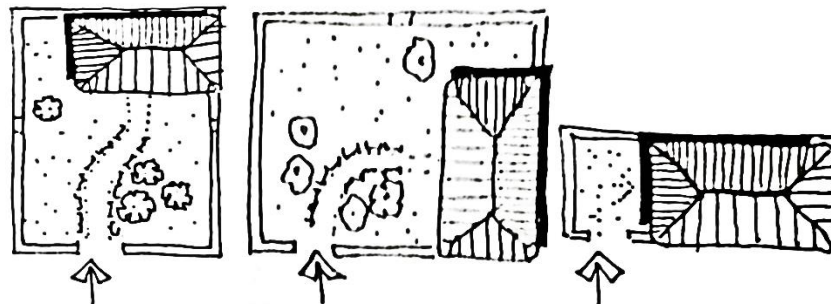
Sketch of the Situation Plan of 1. Shehzade House; 2. Saray House; 3> House of Family Qyse. (B. Ceko)
